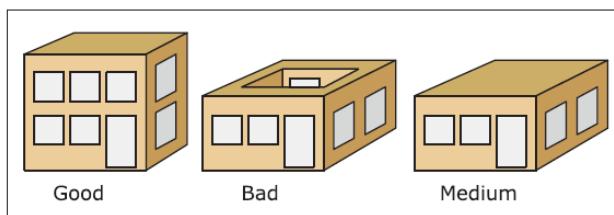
Building shape – Surface to Volume Ratio [8] (color scheme, all buildings should have same height (just ground floor), depth of medium building should be double the good building)
